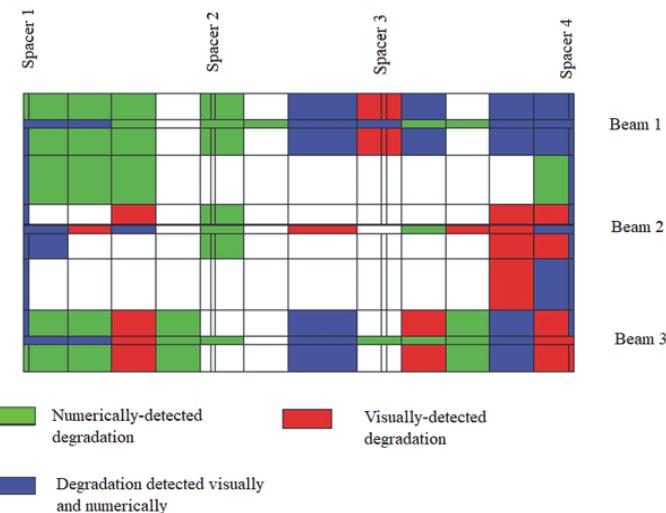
Plan view of the bridge with details of the damage recorded by the two visual and numerical approaches.
